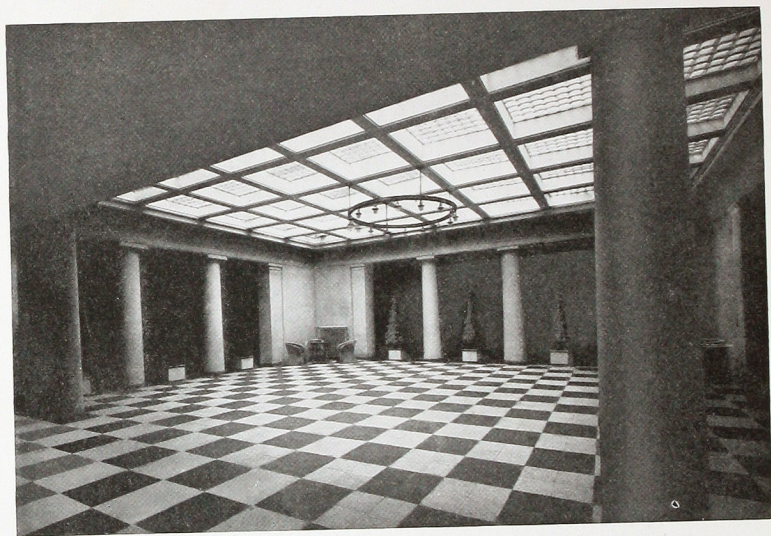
Interior made light by Keppler Roof Light Construction. Note the all-glass undersurface.
